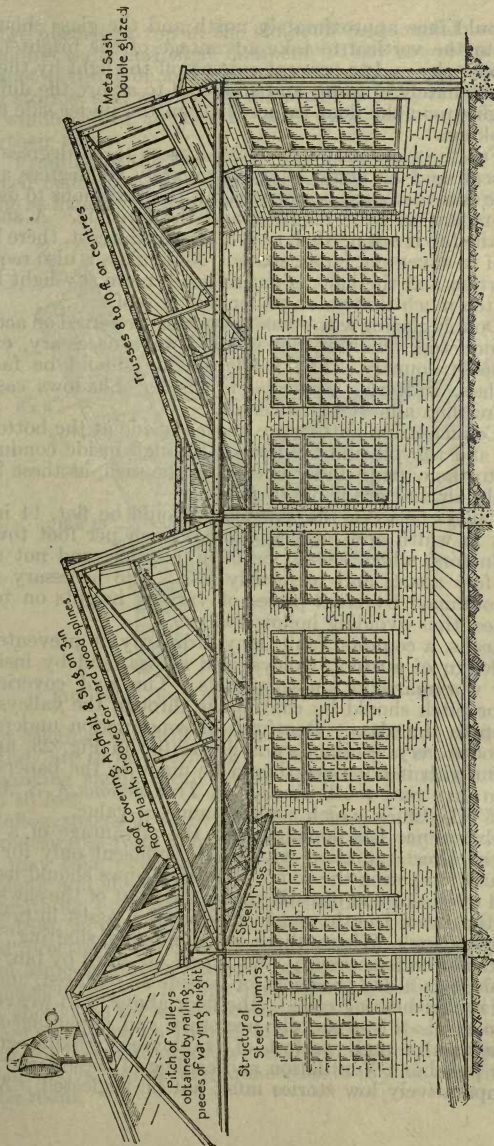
"Saw-tooth" Roof for Machine Shop.
